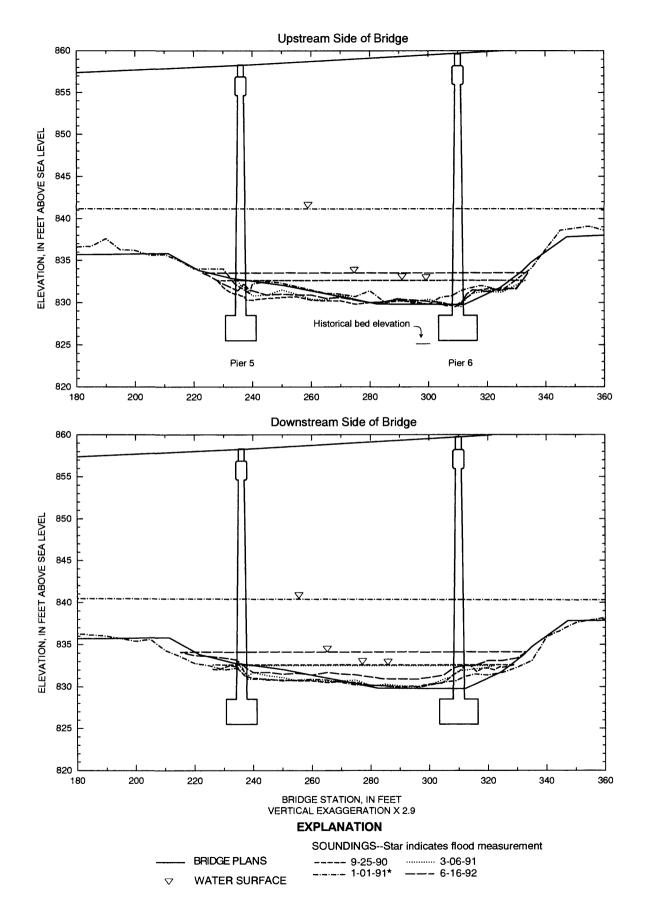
Cross sections showing bed elevations from bridge plans and soundings, State Road 109 over White River at Anderson, Indiana.
